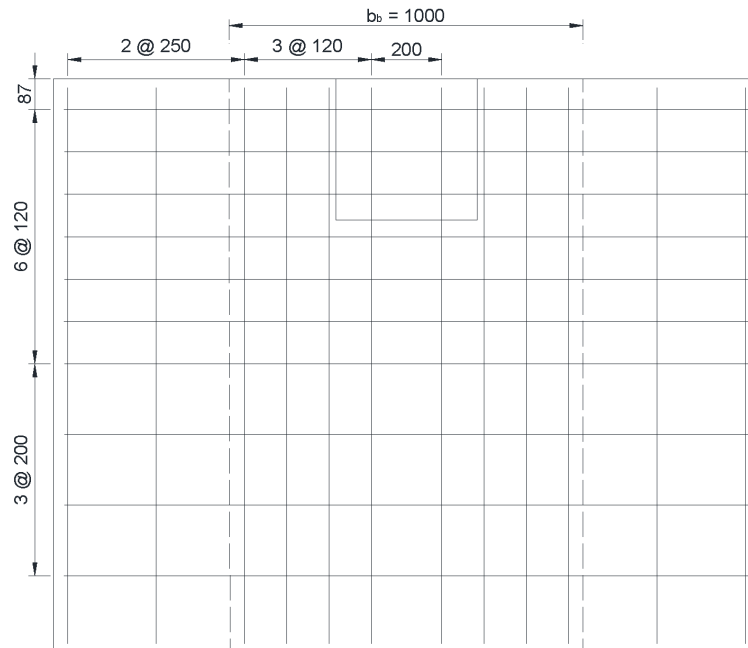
Top mat reinforcement details for Specimen 3 (15M bars) (units in mm)
